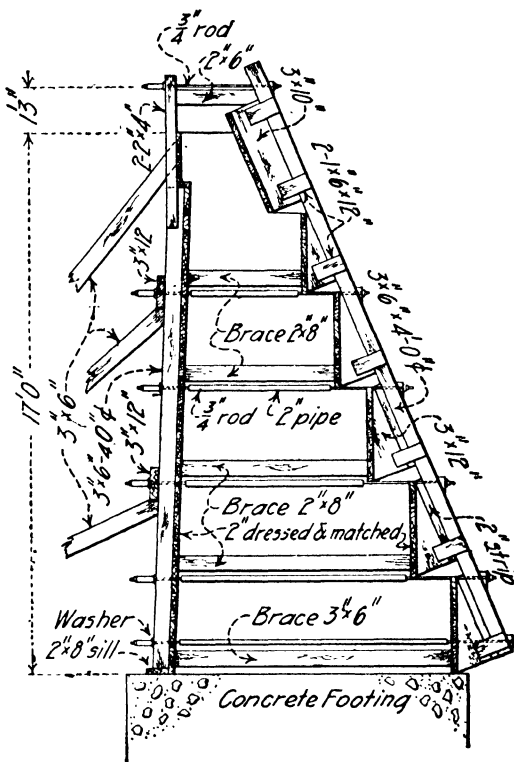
FORMS FOR C. & N. W. RY. RETAINING WALL.
